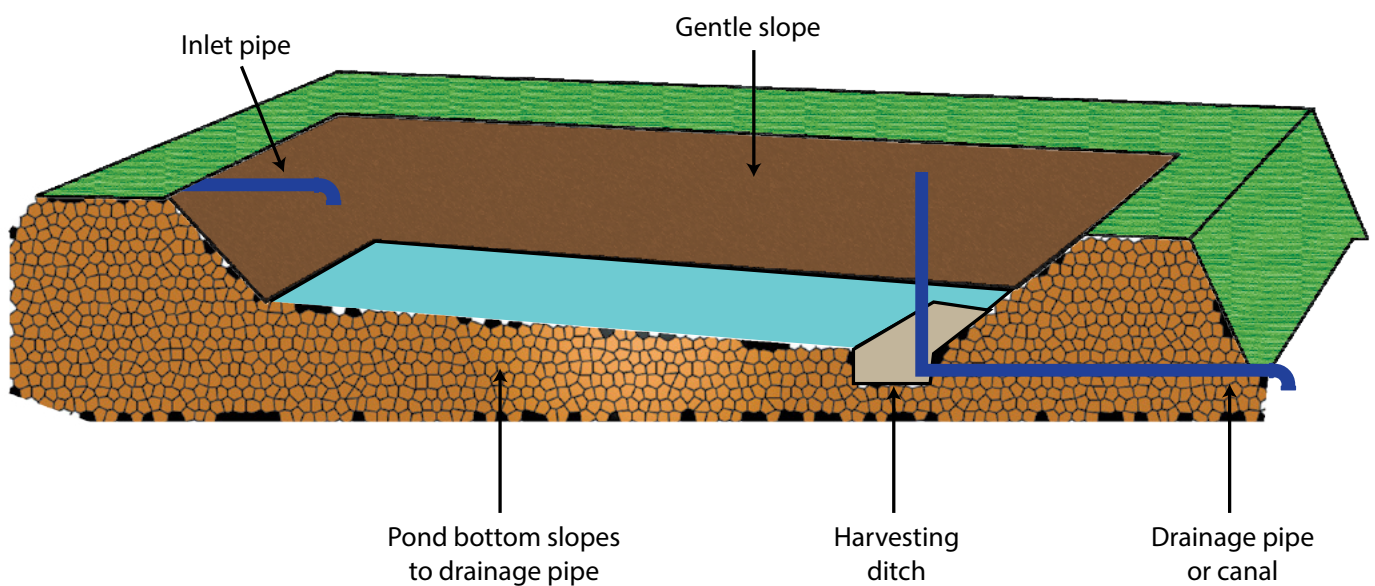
Pond layout with inlet, outlet and harvesting ditch structures.
